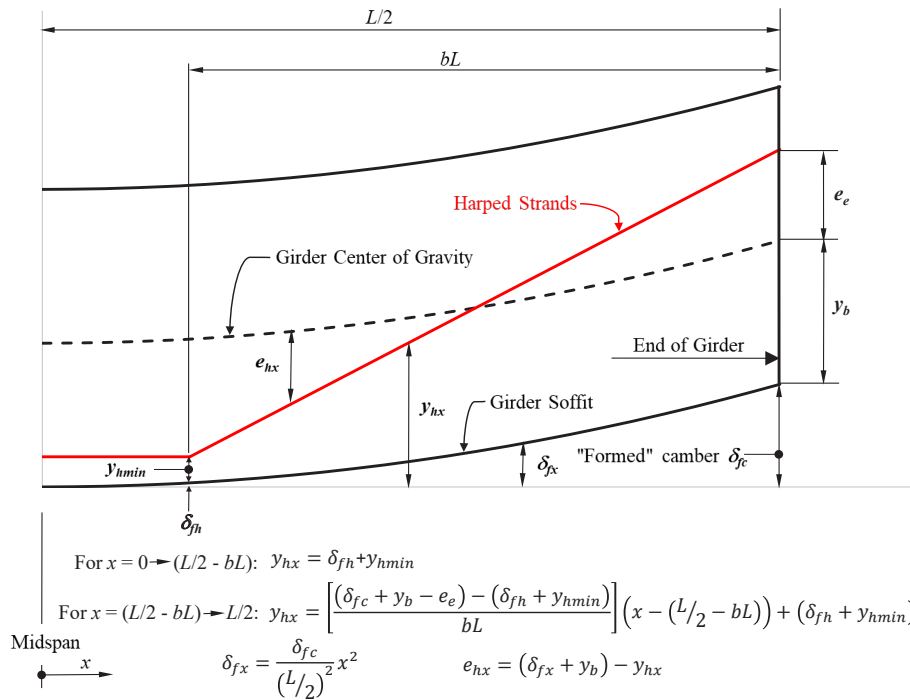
Harped strand eccentricity of sag-formed camber profile for half girder length. Note: Eccentricity of harped strands at the girder ends is negative when harped strands are above girder center of gravity. b = fraction of girder length from end of girder to nearest harp point; e_e = eccentricity of harped strands at the girder ends; e_{hx} = eccentricity of harped strands at a section x ; L = length of precast concrete girder; x = horizontal distance from designated point of origin to section under consideration; x = horizontal distance from designated point of origin to section under consideration; y_b = distance from bottom of girder to center of gravity of gross girder section; y_{hmin} = minimum distance from bottom of girder to center of gravity of harped strands; y_{hx} = elevation of harped strands from lowest girder soffit elevation at a section x ; δ_{fc} = maximum value of formed camber; δ_{fh} = formed camber at harp point; δ_{fx} = formed camber at a section x .
